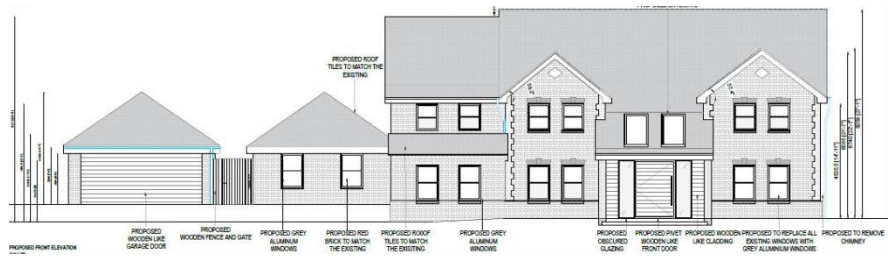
Proposed Front Elevation planning ref: 23/00039/FUL
